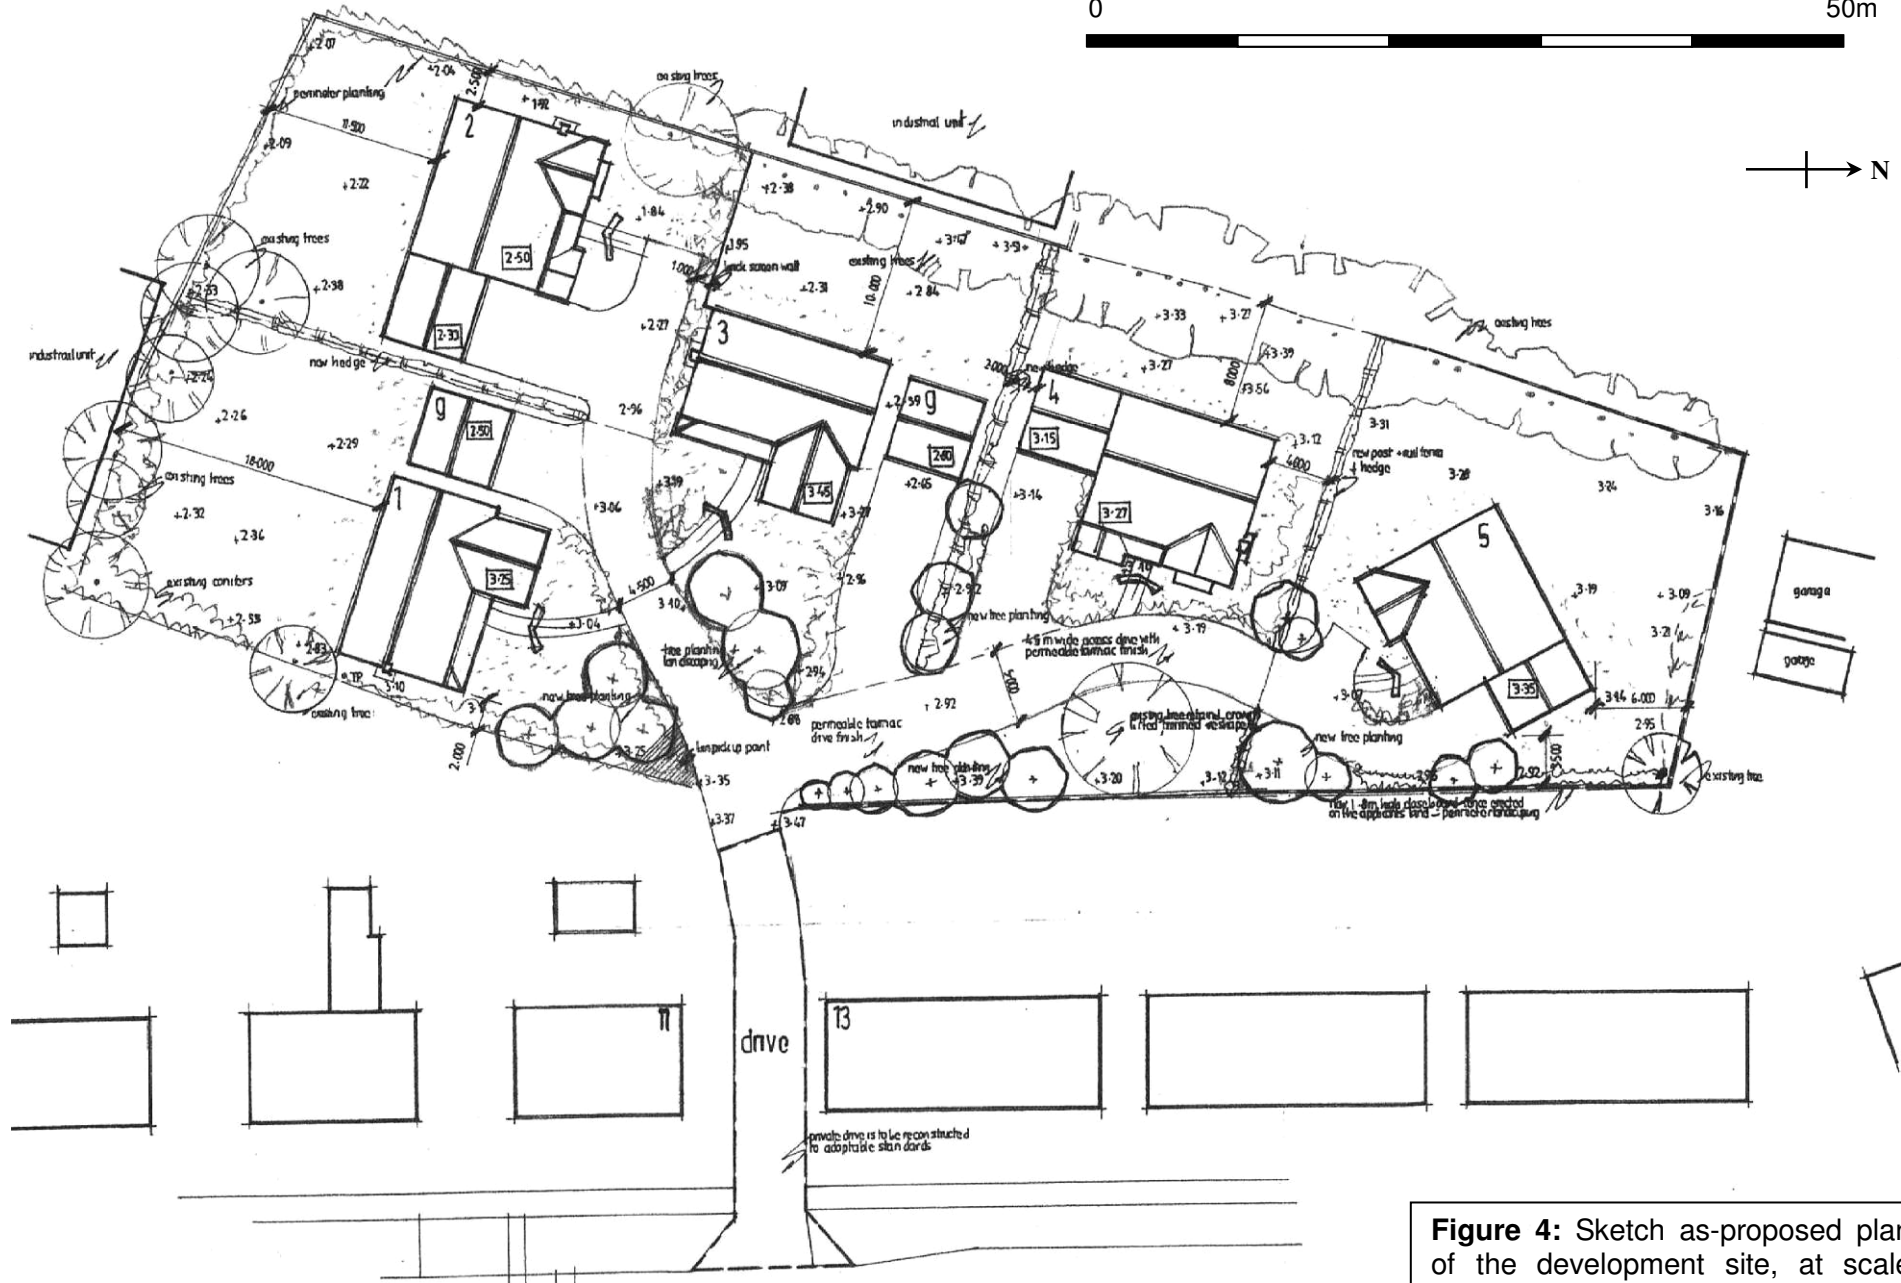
Sketch as-proposed plan of the development site, at scale 1:500. Plan supplied by client.
